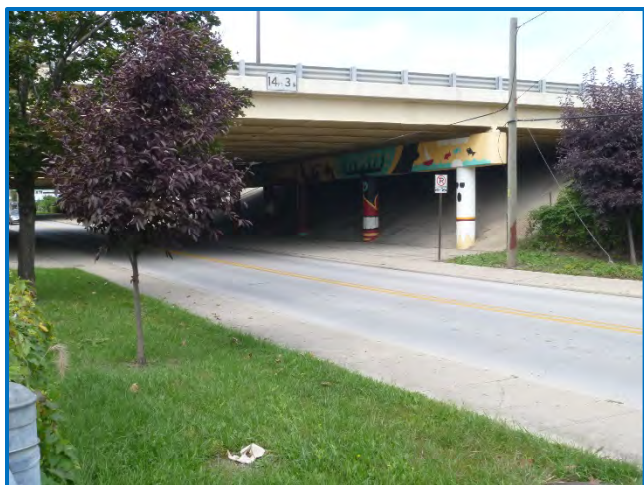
View of the I-65/I-70 bridges over St. Clair Street facing northwest (10/5/2016). No water resources were observed at this location.
